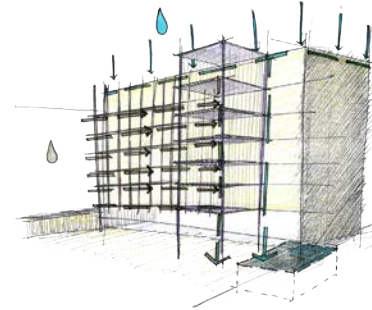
Iteration 3: The roof moved from between Blocks C and D to between Blocks B and C to better control light for residential storeys 6-9 Block B. Outdoor landscape extension was provided to each storey of Block B and a green wall added to Block D, where the linking buildings between the blocks were demolished. Here an emphasis was placed on direct movement, accessibility through ramps and breaking through the wall of Block C which separates the site from the street (Author 2016)
